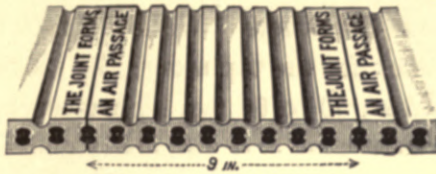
"Broomhall" Vitrified Stoneware Ventilating Damp-course, $1\frac{1}{2}$, $2\frac{1}{2}$, and 3 inches thick, with Open Joints.
